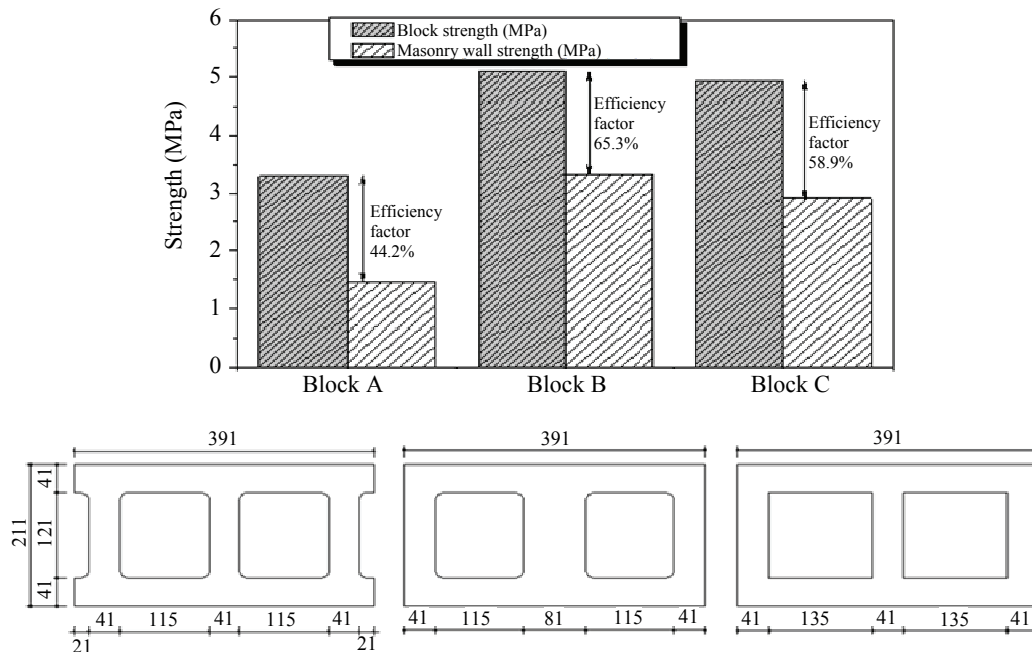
Geometric shape of concrete units tested at Building Technology Laboratory (units in mm) [7].
